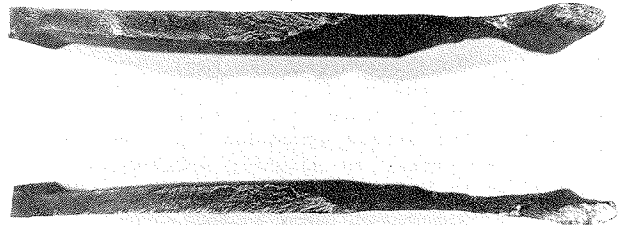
Fatigue crack surface in deteriorated compression flange of test beam 1.
